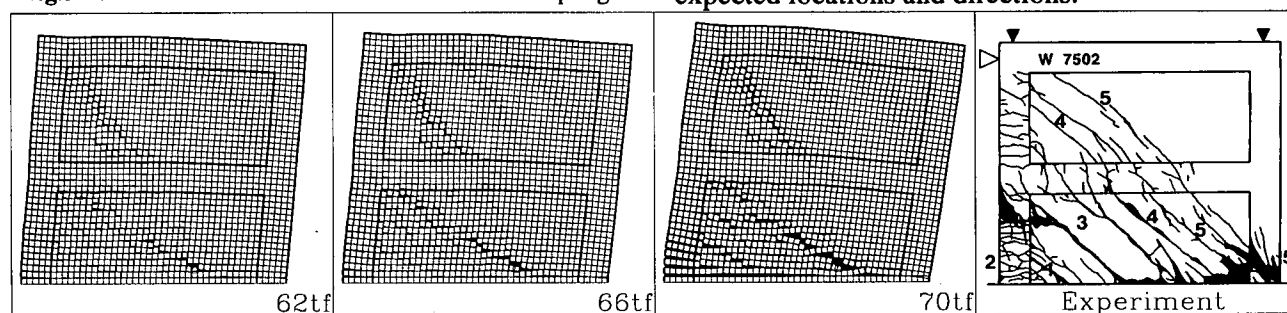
Deformed shape and crack locations of 2-storied RC wall structure (Scale Factor=30)
